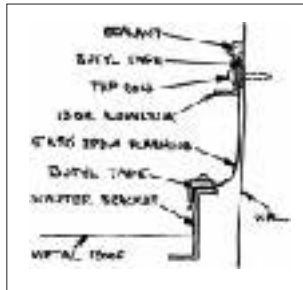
The rubber flashing creates a watertight seal and lets the roof panels move next to the wall.
